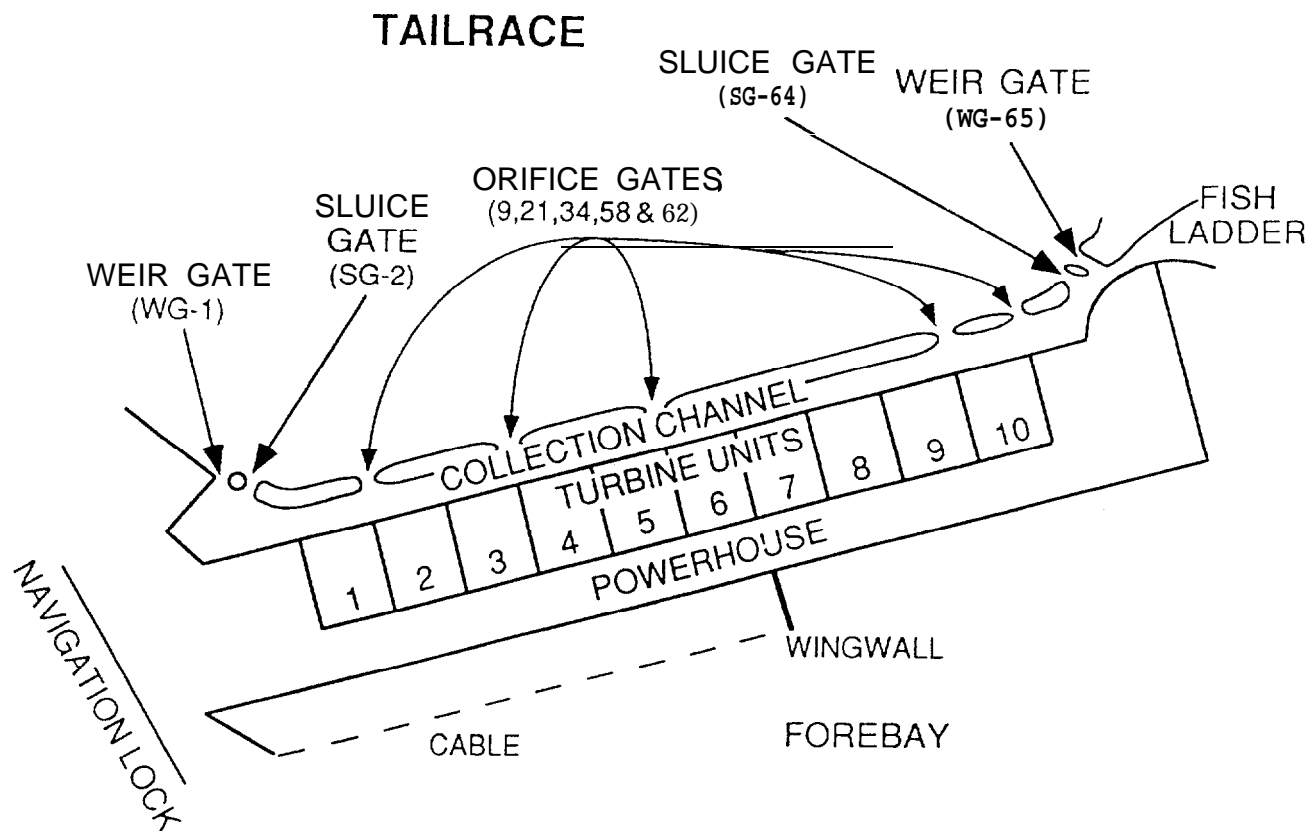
Location of adult fish attraction/collection system, forebay wingwall, and trashrack cleaning cable at Bonneville Dam First Powerhouse.
